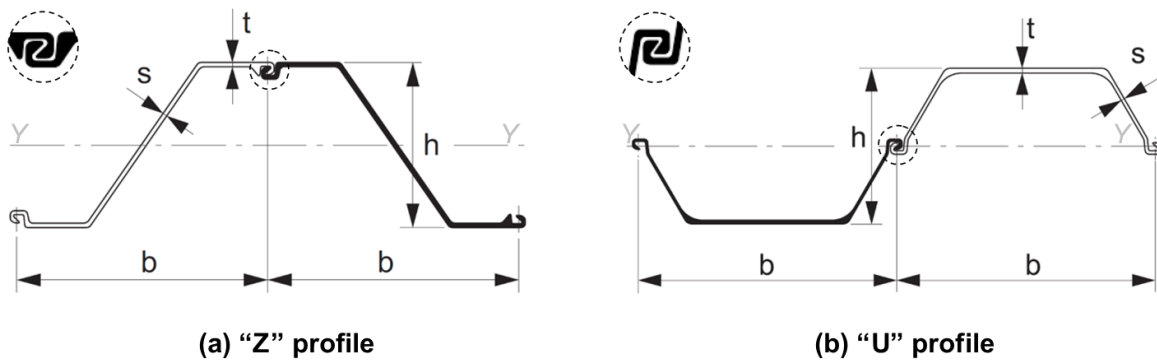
Steel sheet pile sections: in the circle, the specific Larssen interlock is highlighted.
